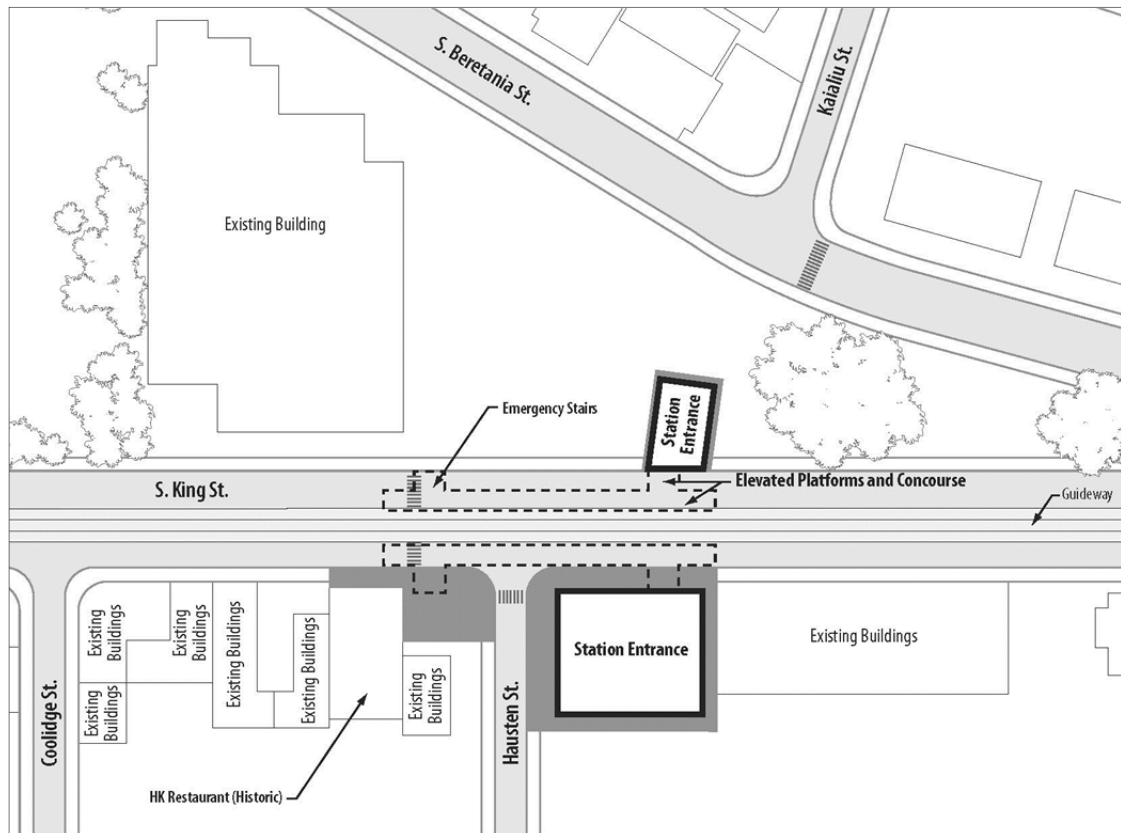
Beretania Street Tunnel Alternative Hausten Street Station
